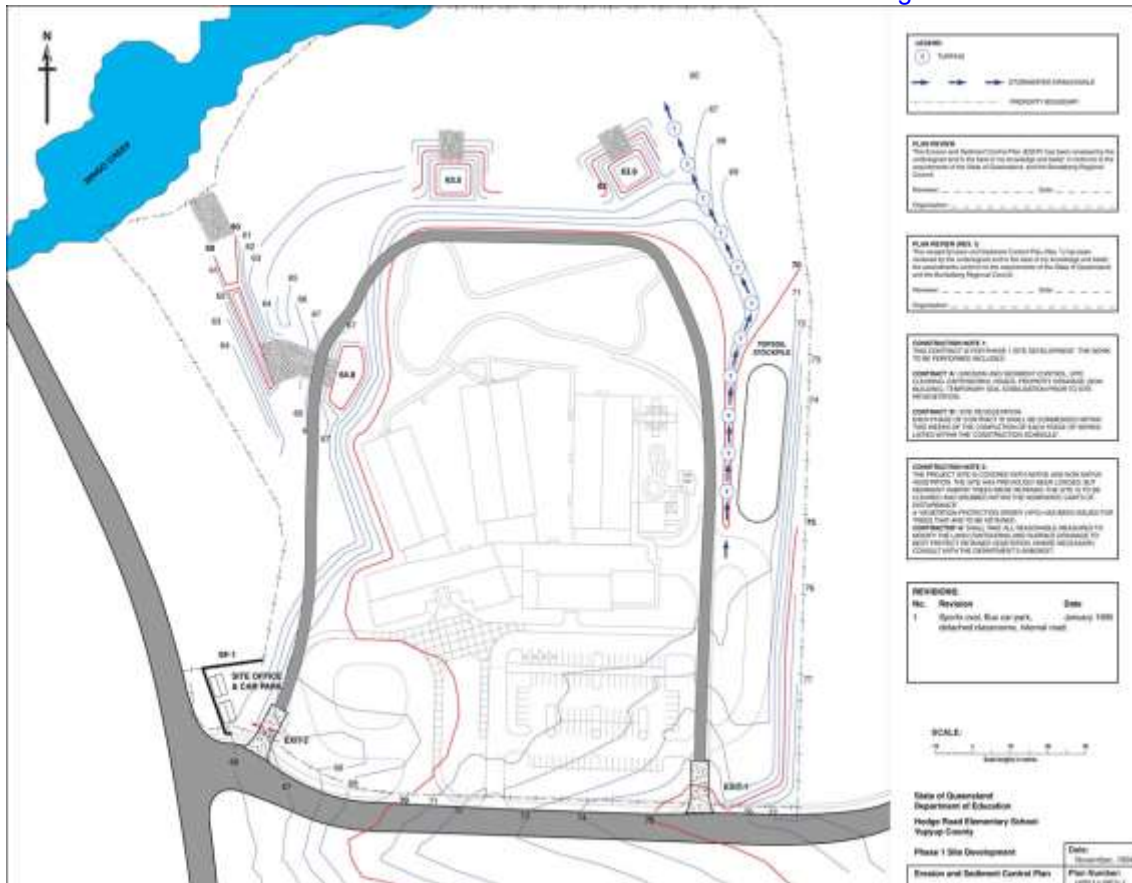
Turfing of permanent stormwater channel on the Hodge Road school site
